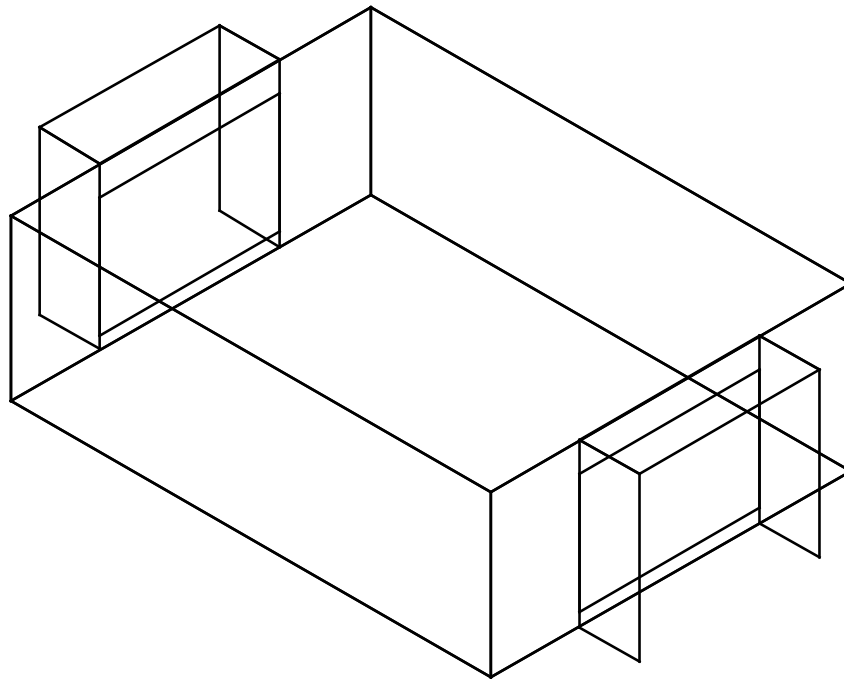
Building with East/West Window Orientation and Shade Overhang and Shade Fins added (Case 630) - Isometric View of Southeast Corner
